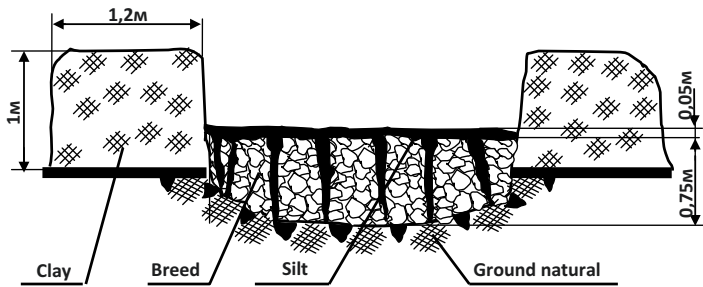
Section of a Rock Dump when forming a layer together with watery waste
